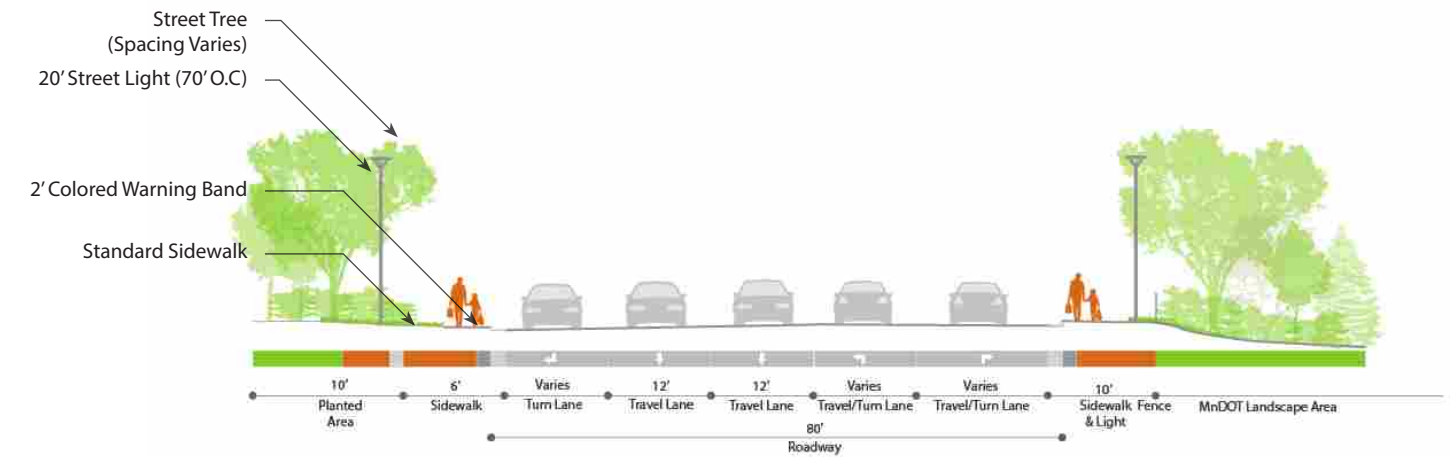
Proposed detail plan of Cartway Lane (typical)
